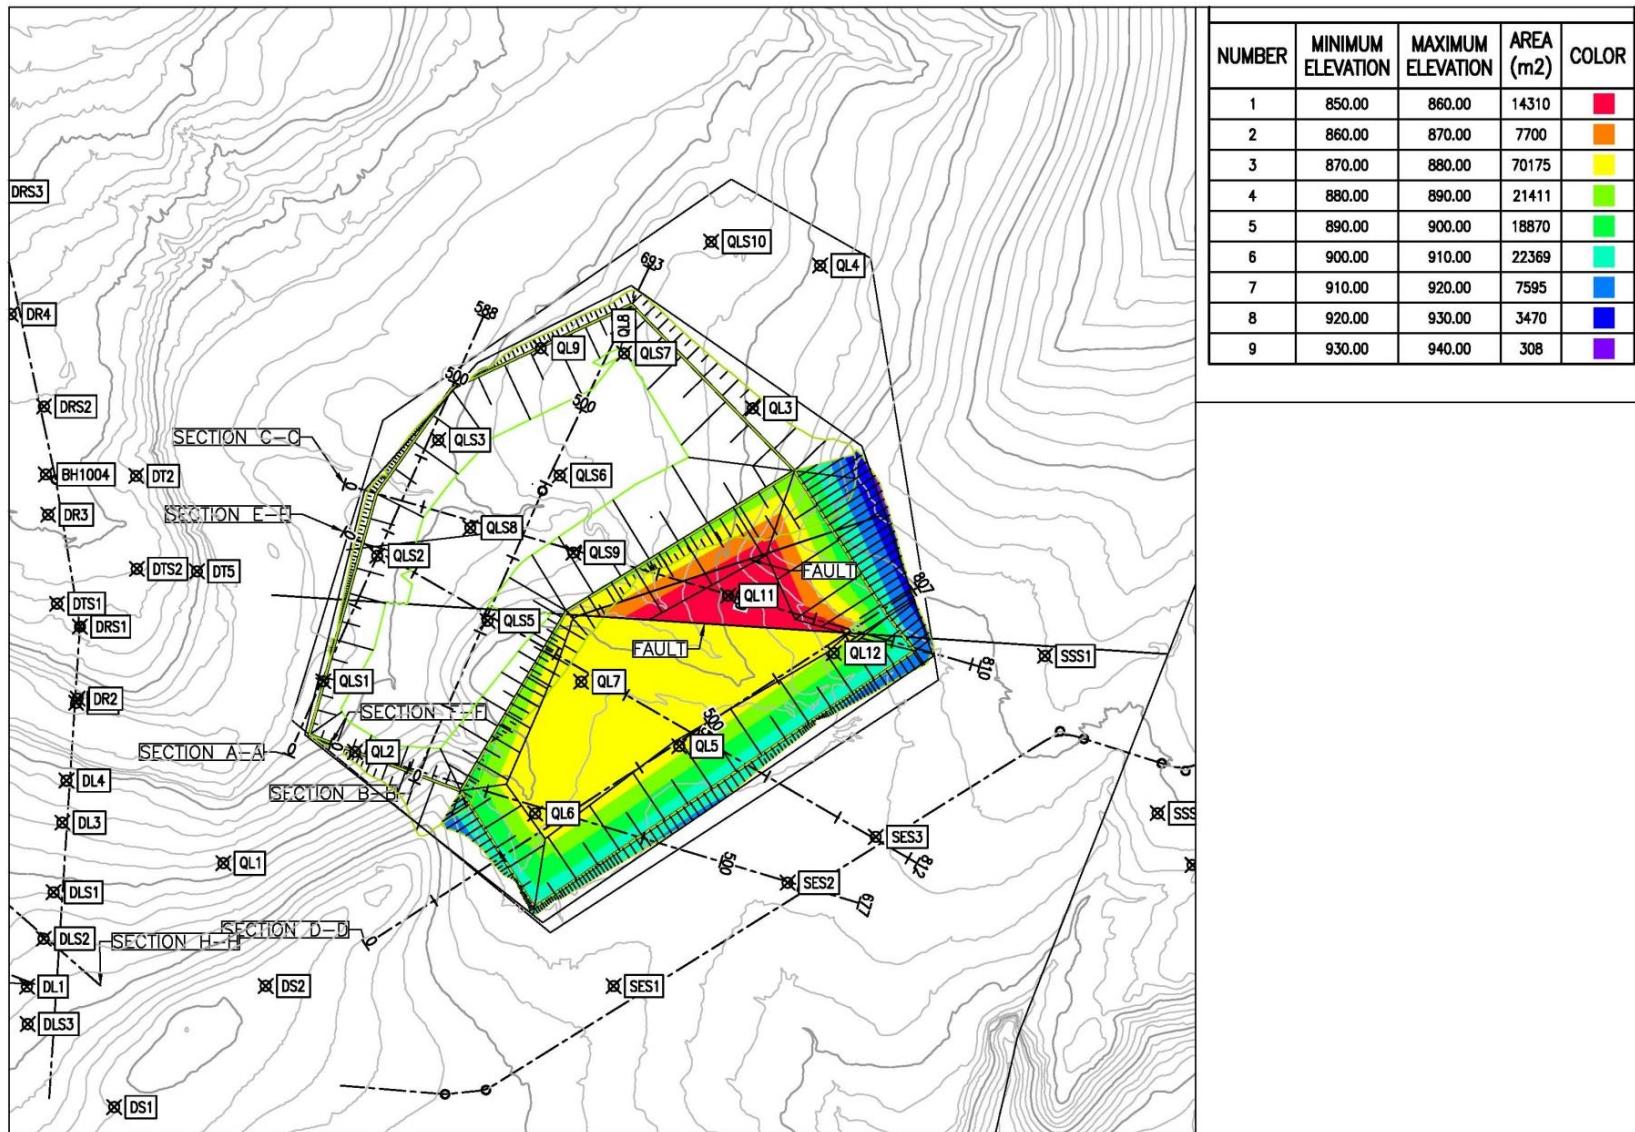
G.2: Plan layout of Quarry I with cross sections and proposed development (2)
